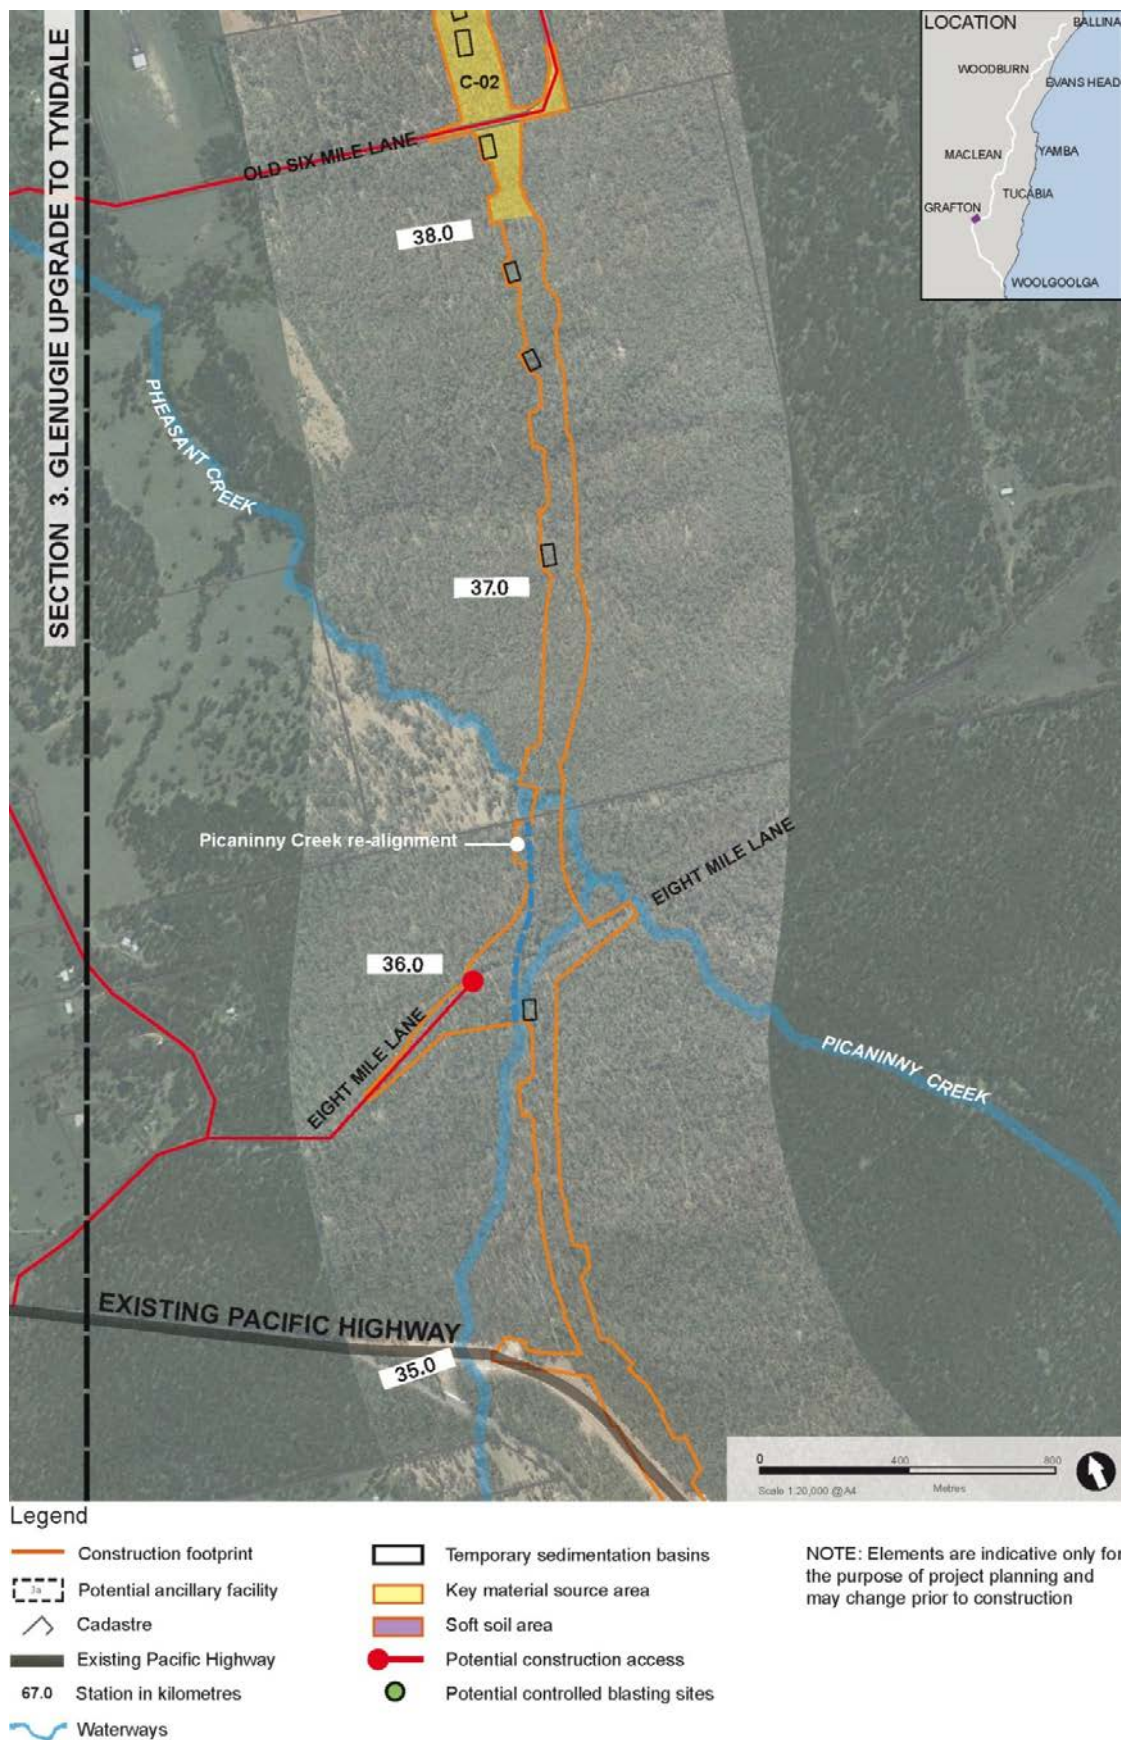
Extent of construction and construction features Section 3 (Station 34.7 to 38.6)
